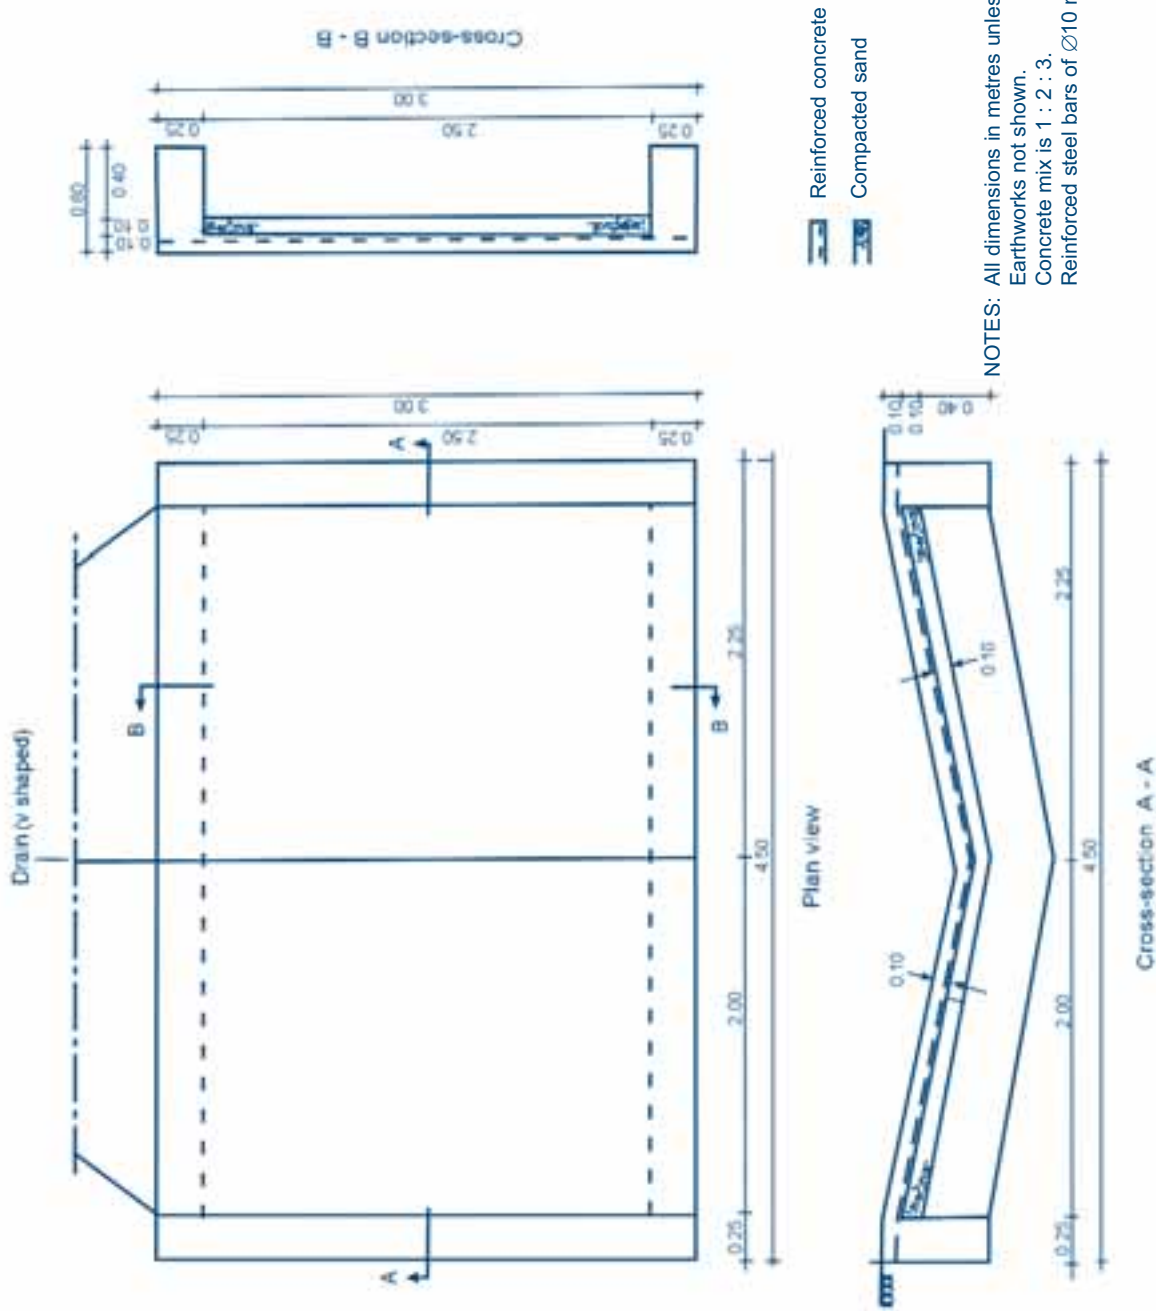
shows a typical design of a saddle bridge or drain-road crossing.
